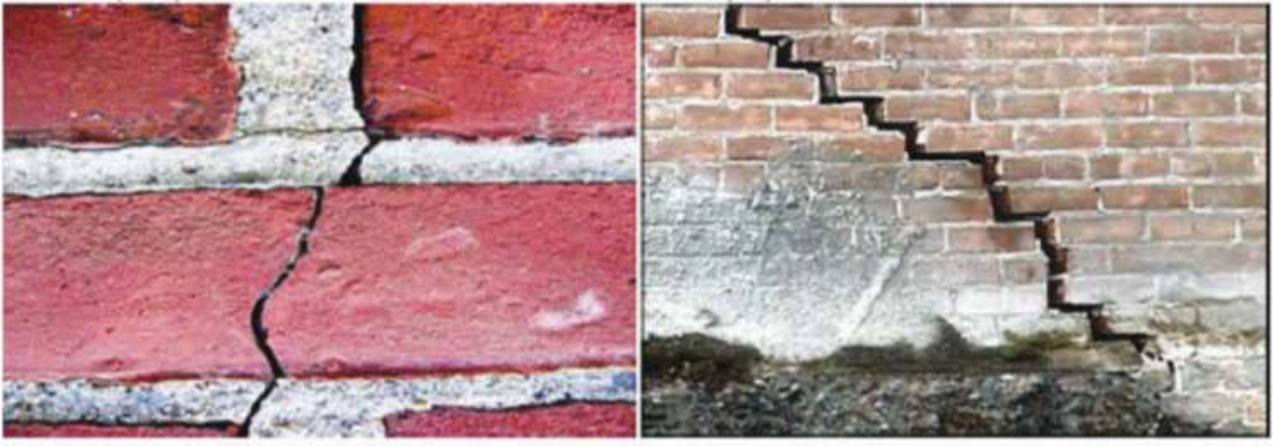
Detachment fracture in brick-masonry walls [Angelillo et al., 2014]
